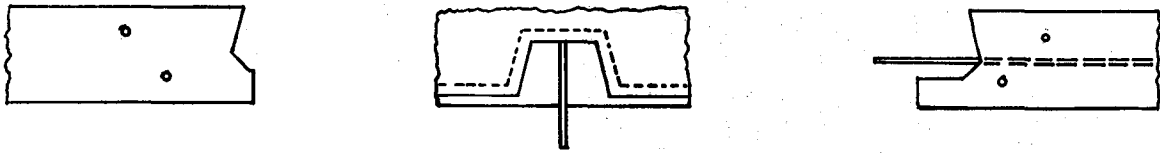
GROUT KEY AND CONNECTION JOINT DETAIL,
